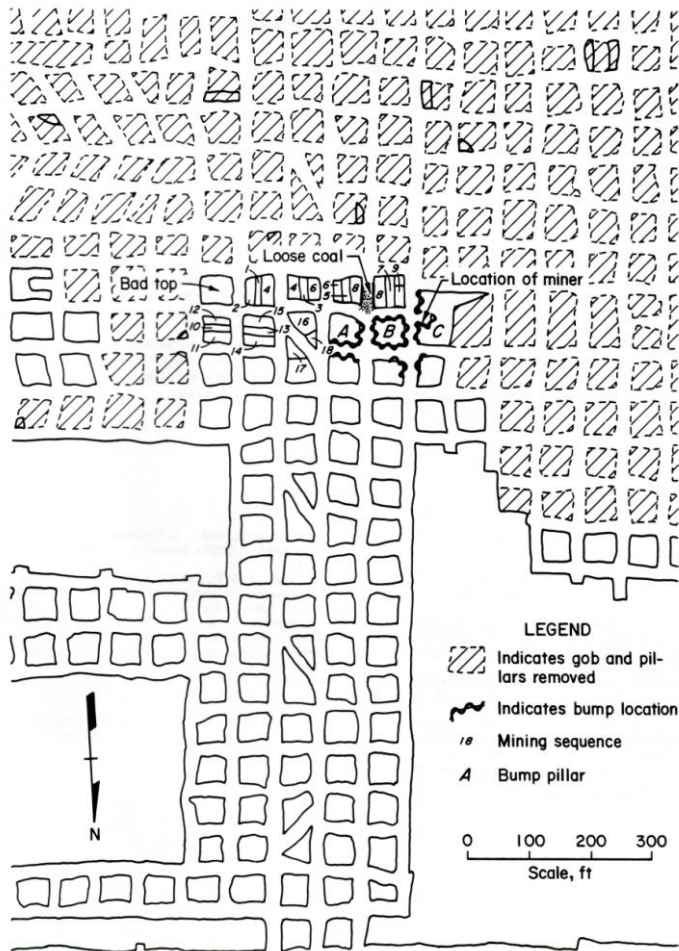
An example of bump in pillar extraction (Campoli et al., 1987)
